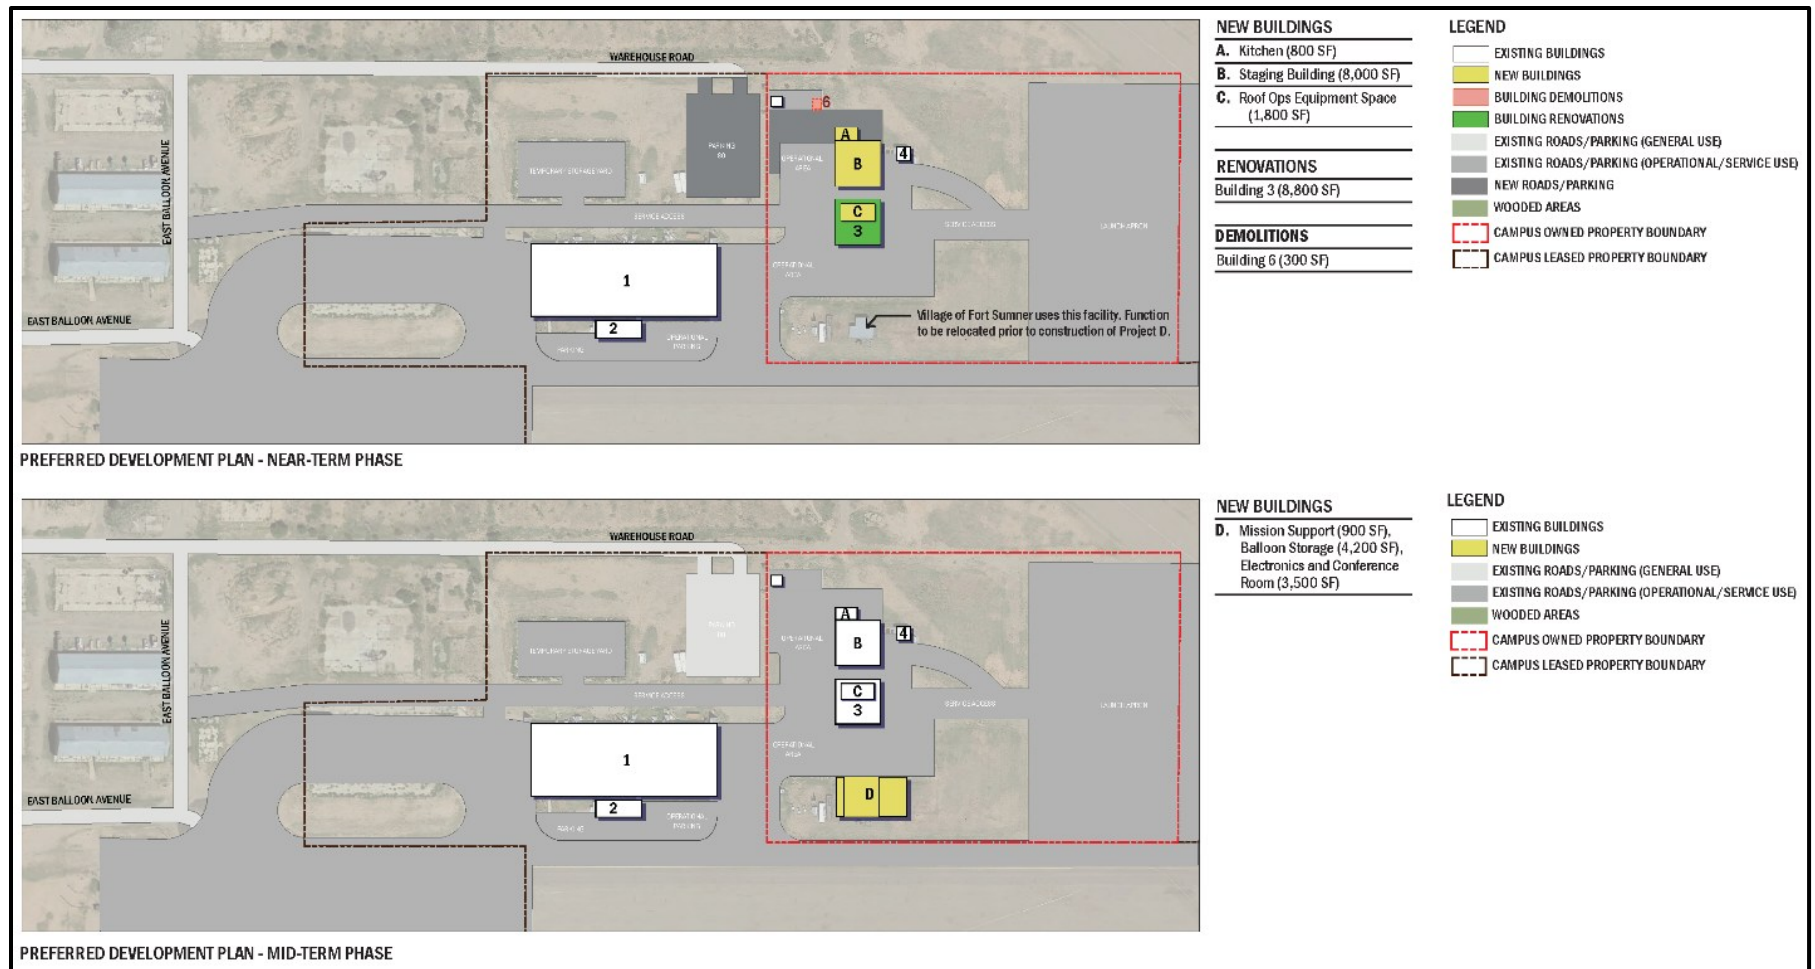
CSBF Fort Sumner Proposed Site Improvements
